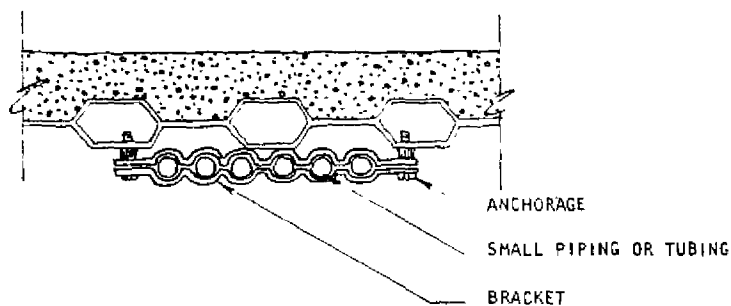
Piping systems. Bracing for small piping or tubing.
